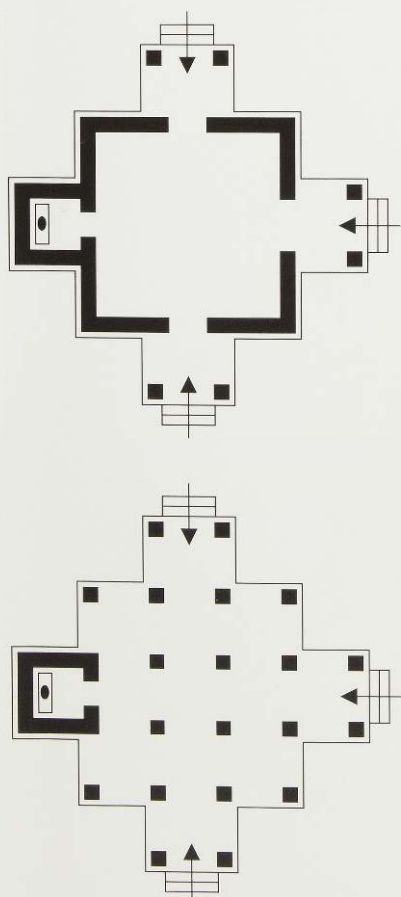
Temples consisting of a shrine, connected to one hall and three porches.
